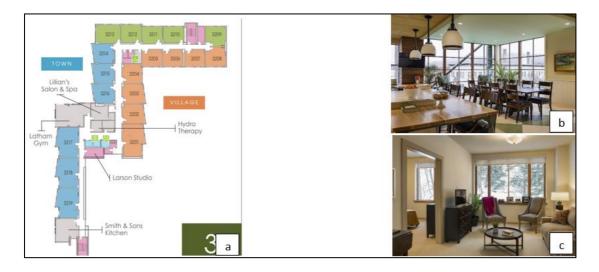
(a) Third-floor plan (b) Kitchen area (c) Bedrooms with living areas (URL-17)
